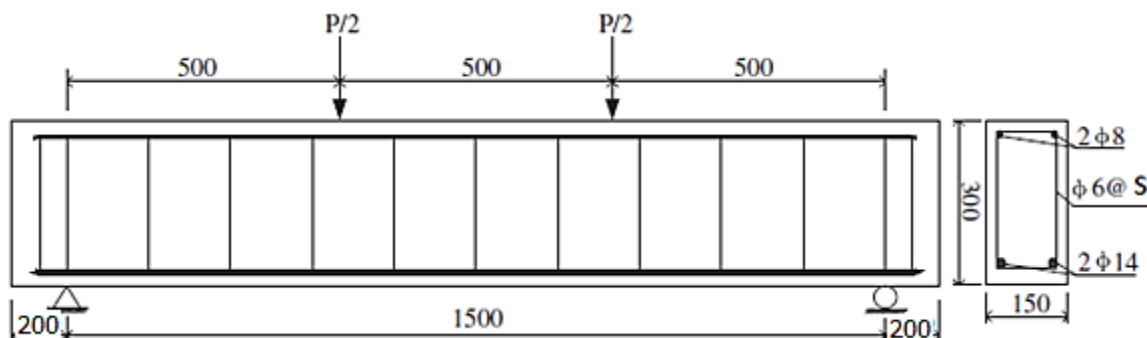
The geometric, loading and boundary conditions and steel reinforcement of the RC beams
